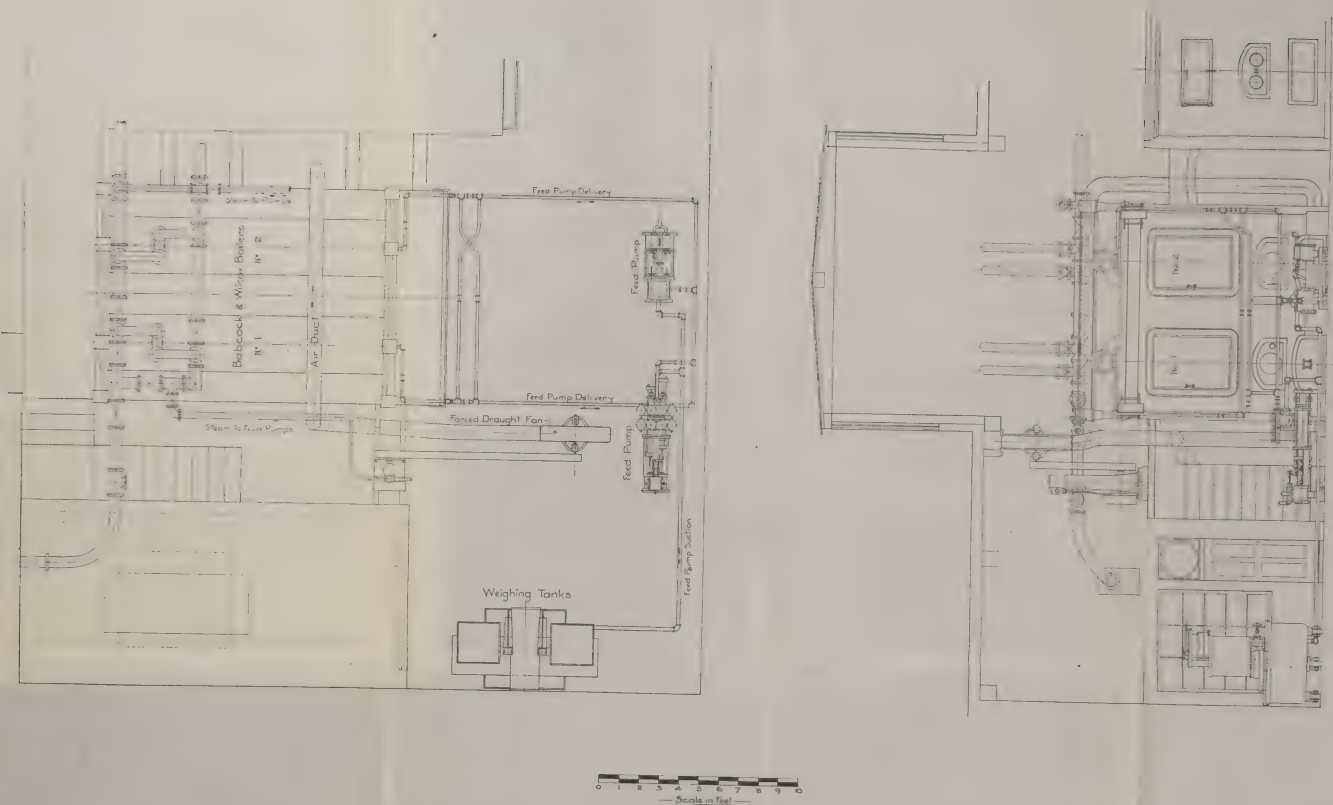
General arrangement of experimental boiler plant. Department of Mechanical Engineering, McGill University
